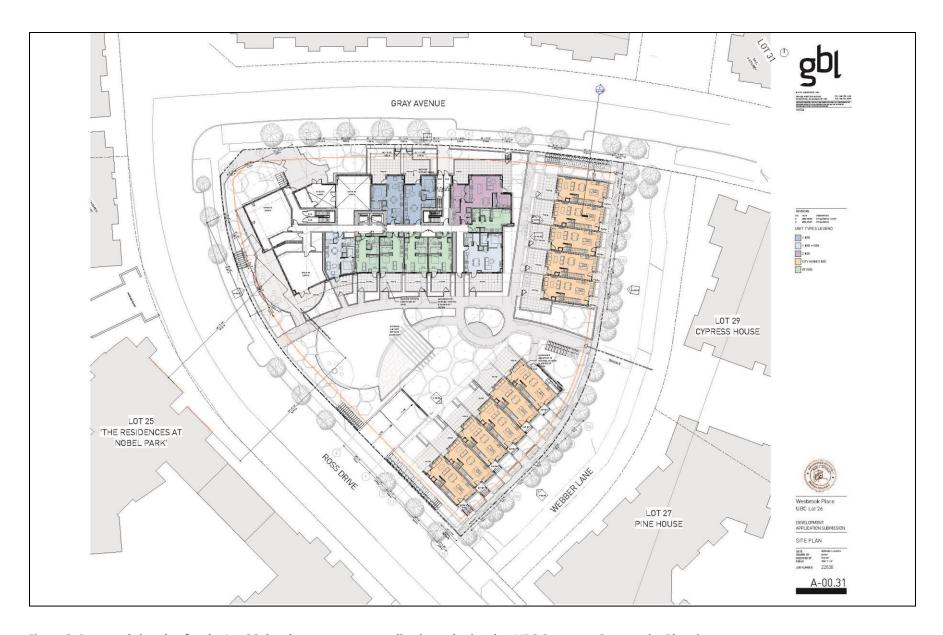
Proposed site plan for the Lot 26 development as per application submitted to UBC Campus + Community Planning.
